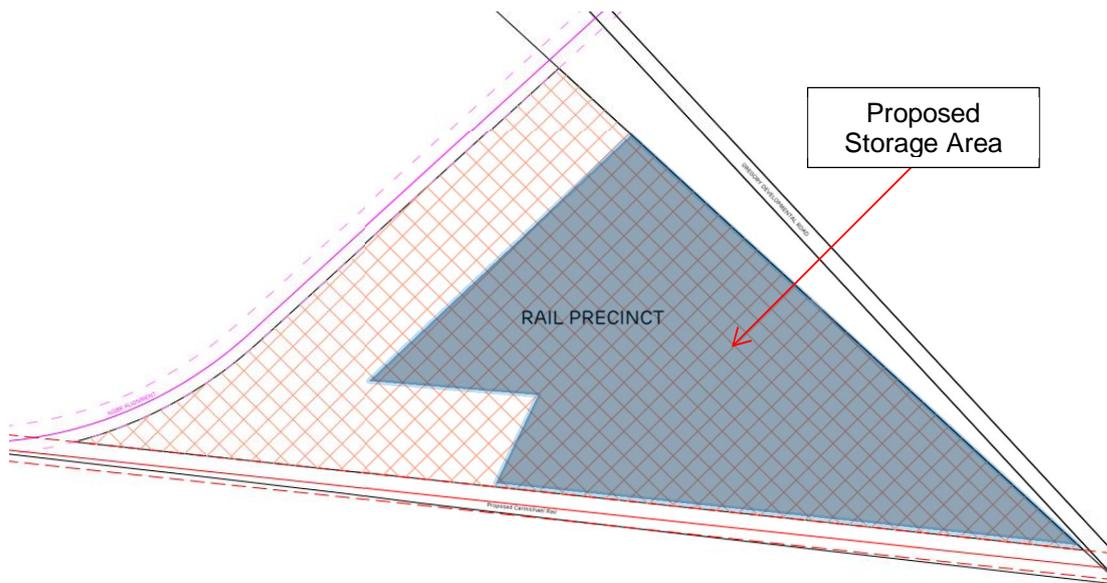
Plan showing entire construction depot area with approximate storage location highlighted
